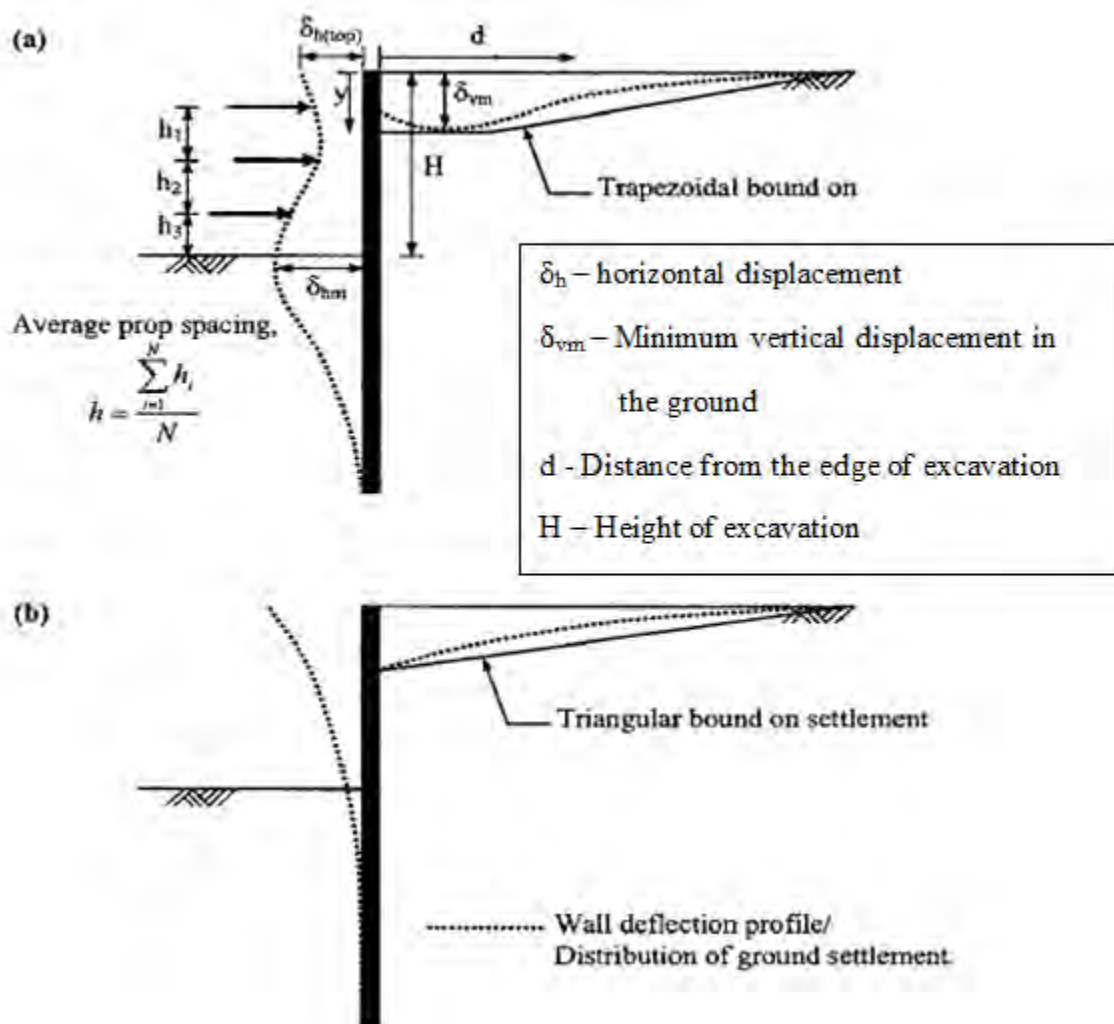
Typical profiles of wall and ground movement for anchored wall [6].
